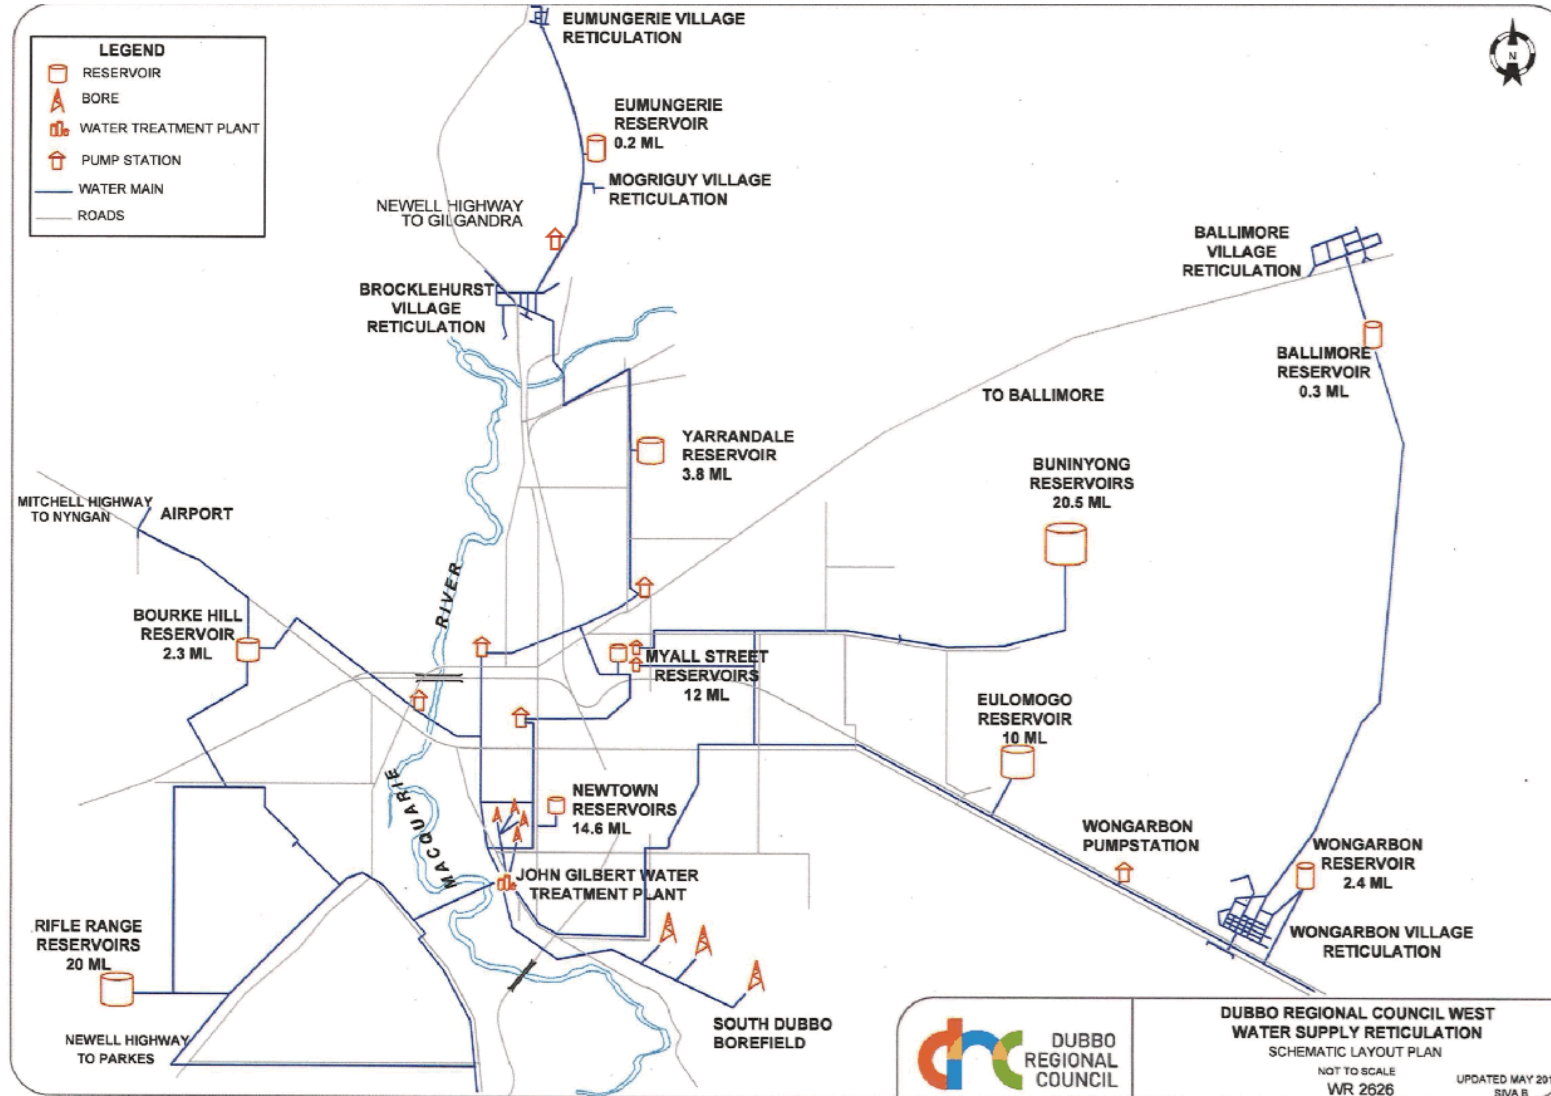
DUBBO WATER SUPPLY RETICULATION SCHEMATIC LAYOUT PLAN
